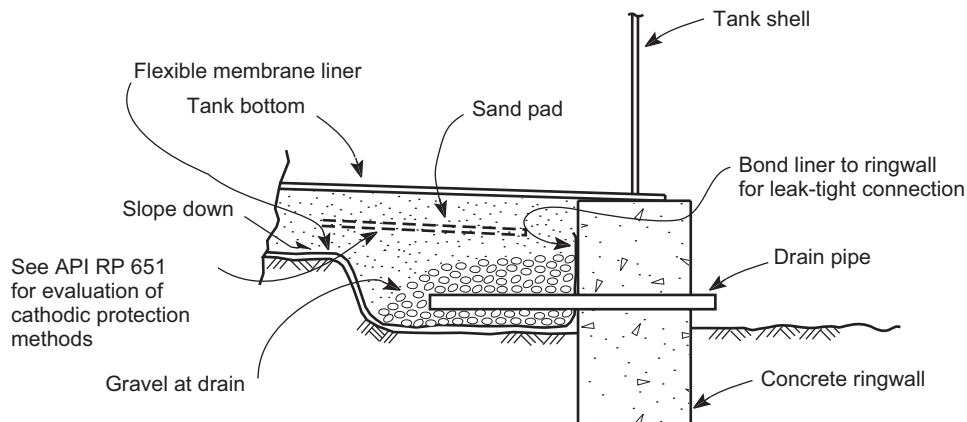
Concrete Ringwall with Undertank Leak Detection at the Tank Perimeter (Typical Arrangement)
